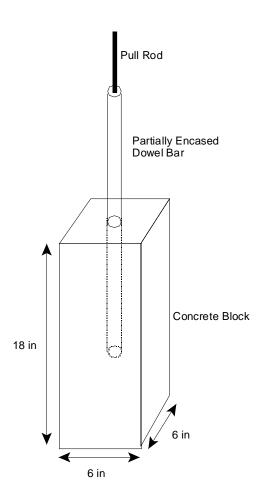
Schematic Illustration of Pull-Out Specimen
